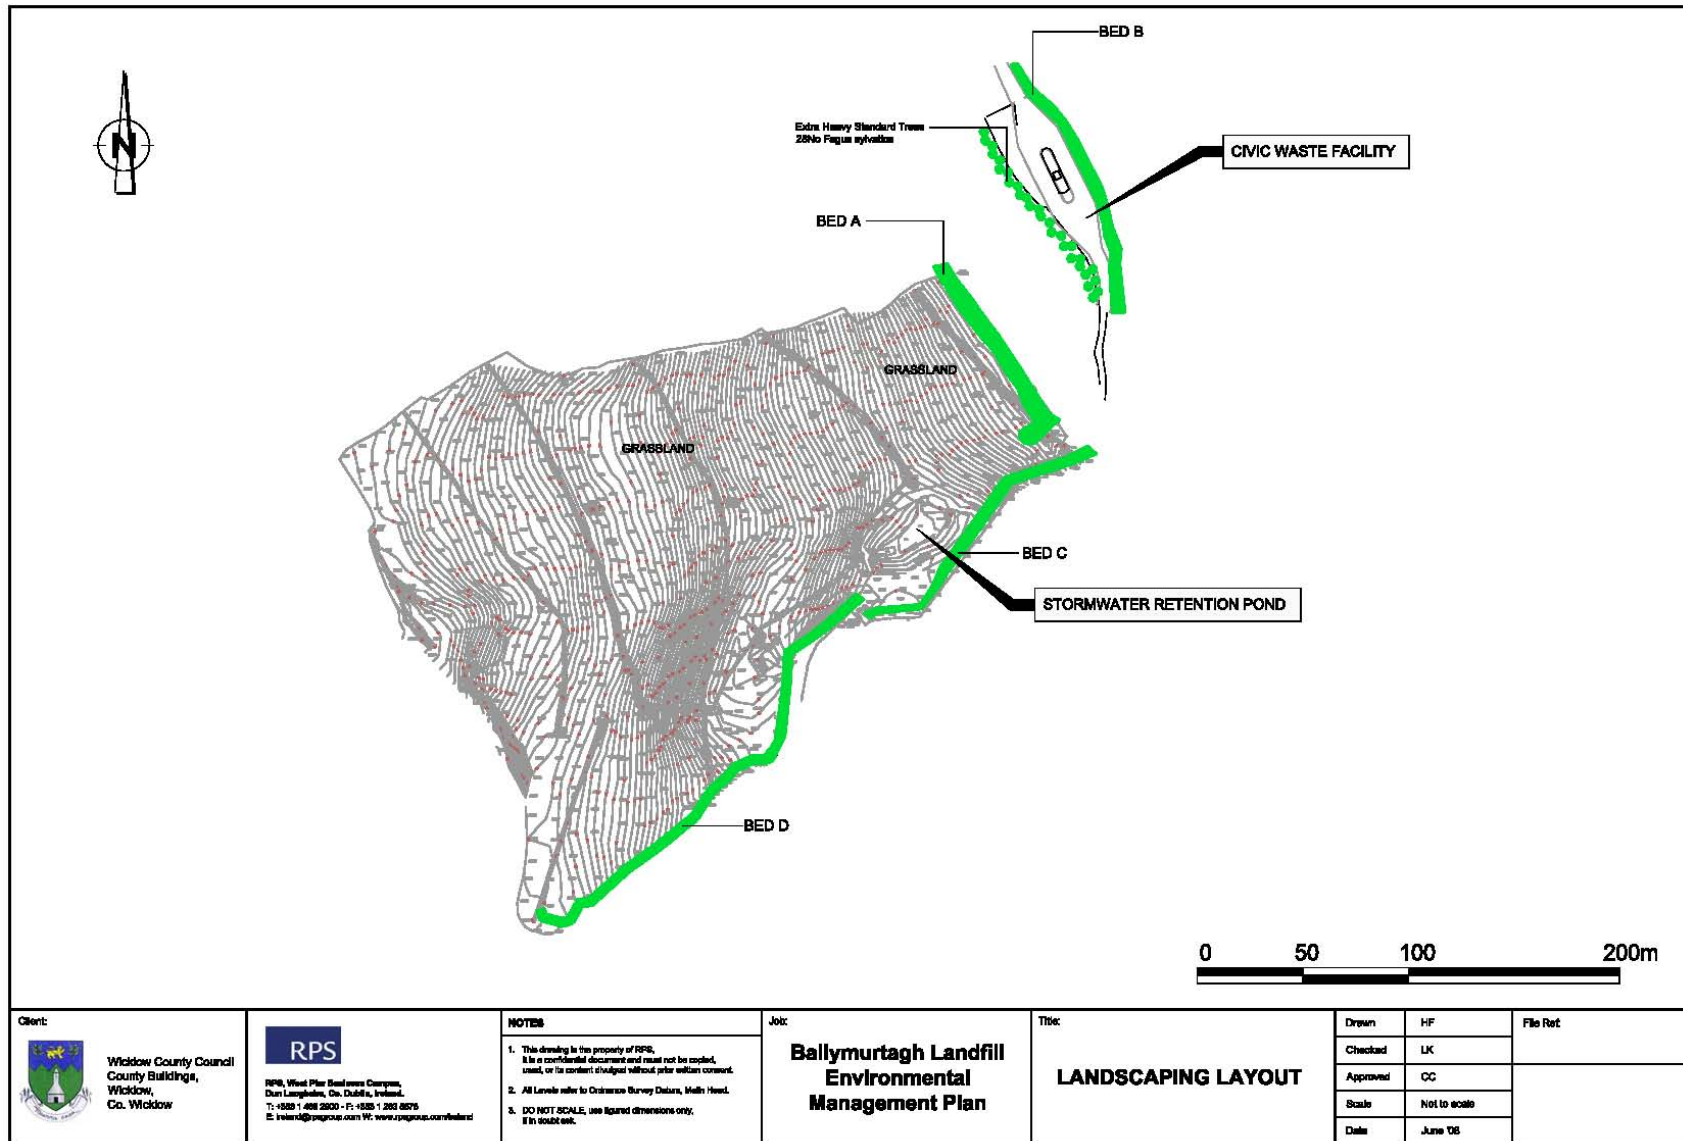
Final Landscaping Plan (RPS, 2008)
